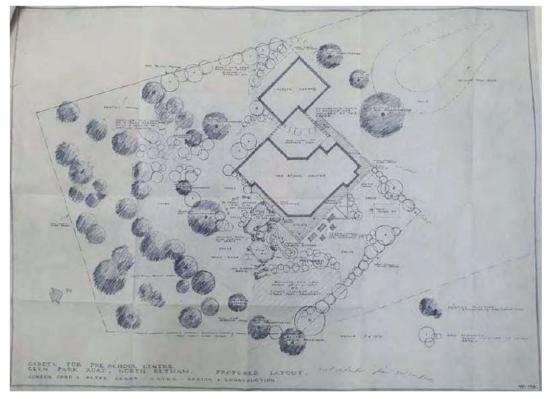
Plan for the proposed layout by landscape designer Gordon Ford and artist, conservationist and landscape architect Peter Glass for the garden at Eltham North Preschool and Infant Welfare Centre, c1973 (PROV c1973, Public Building File).
